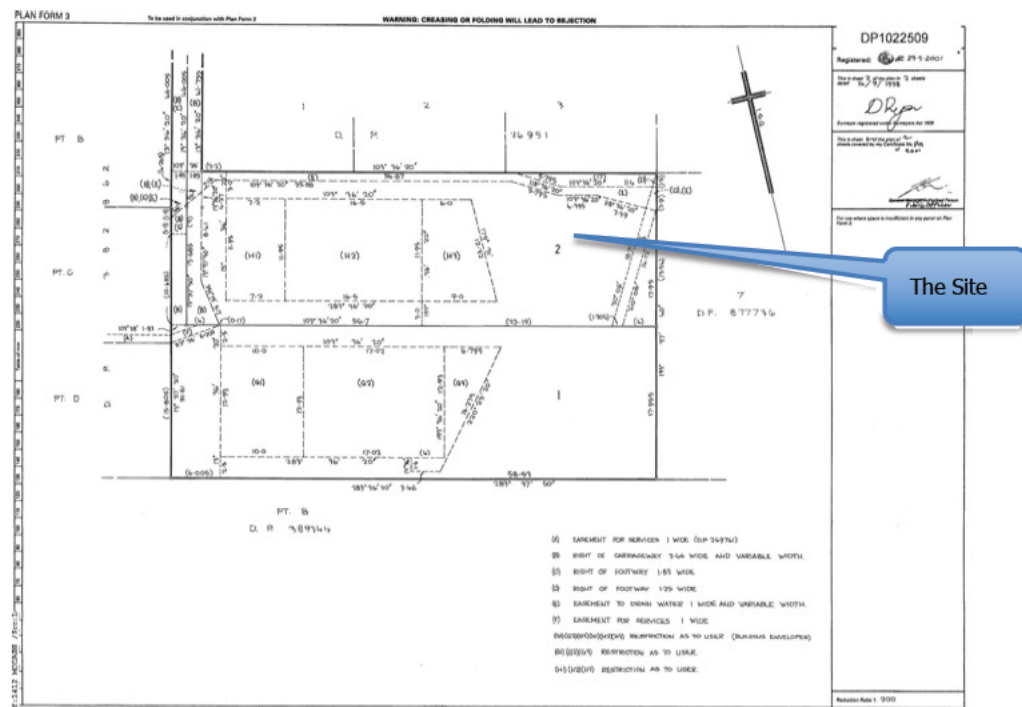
Extract from the Deposited Plan No.1022509 showing the configuration of Lot 1 and Lot 2 and the Restriction as to User on the title (H1, H2 and H3 for Lot 2) and (G1, G2 and G3 for Lot 1) building envelope entitlement areas for each lot shown dashed on the plan.
